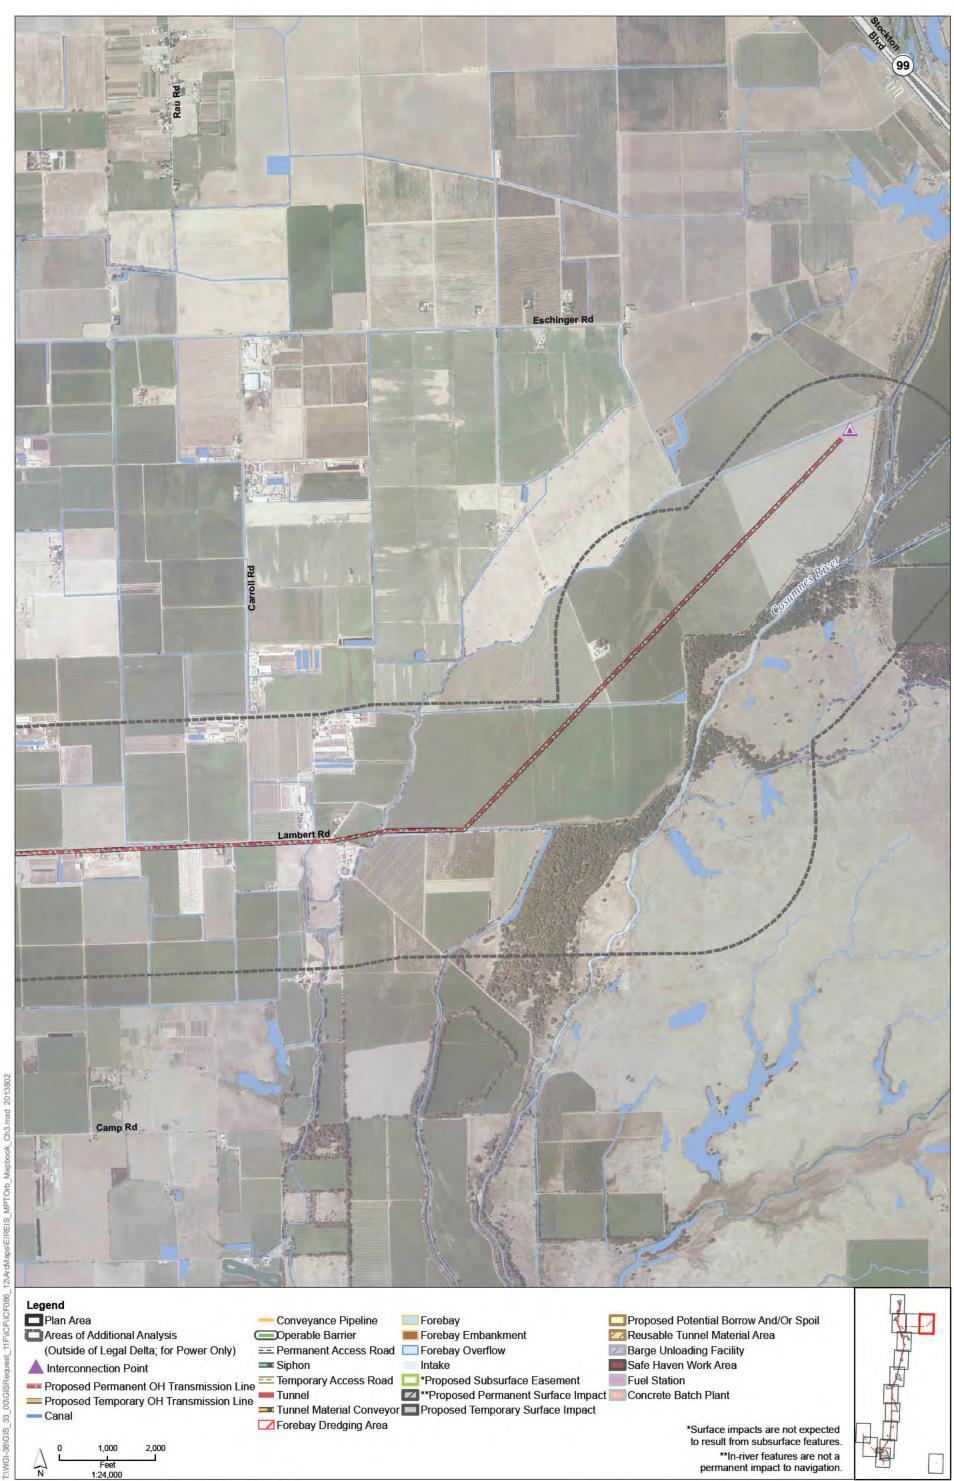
Sheet 2 of 15 Modified Pipeline/Tunnel Alignment (Alternative 4)
